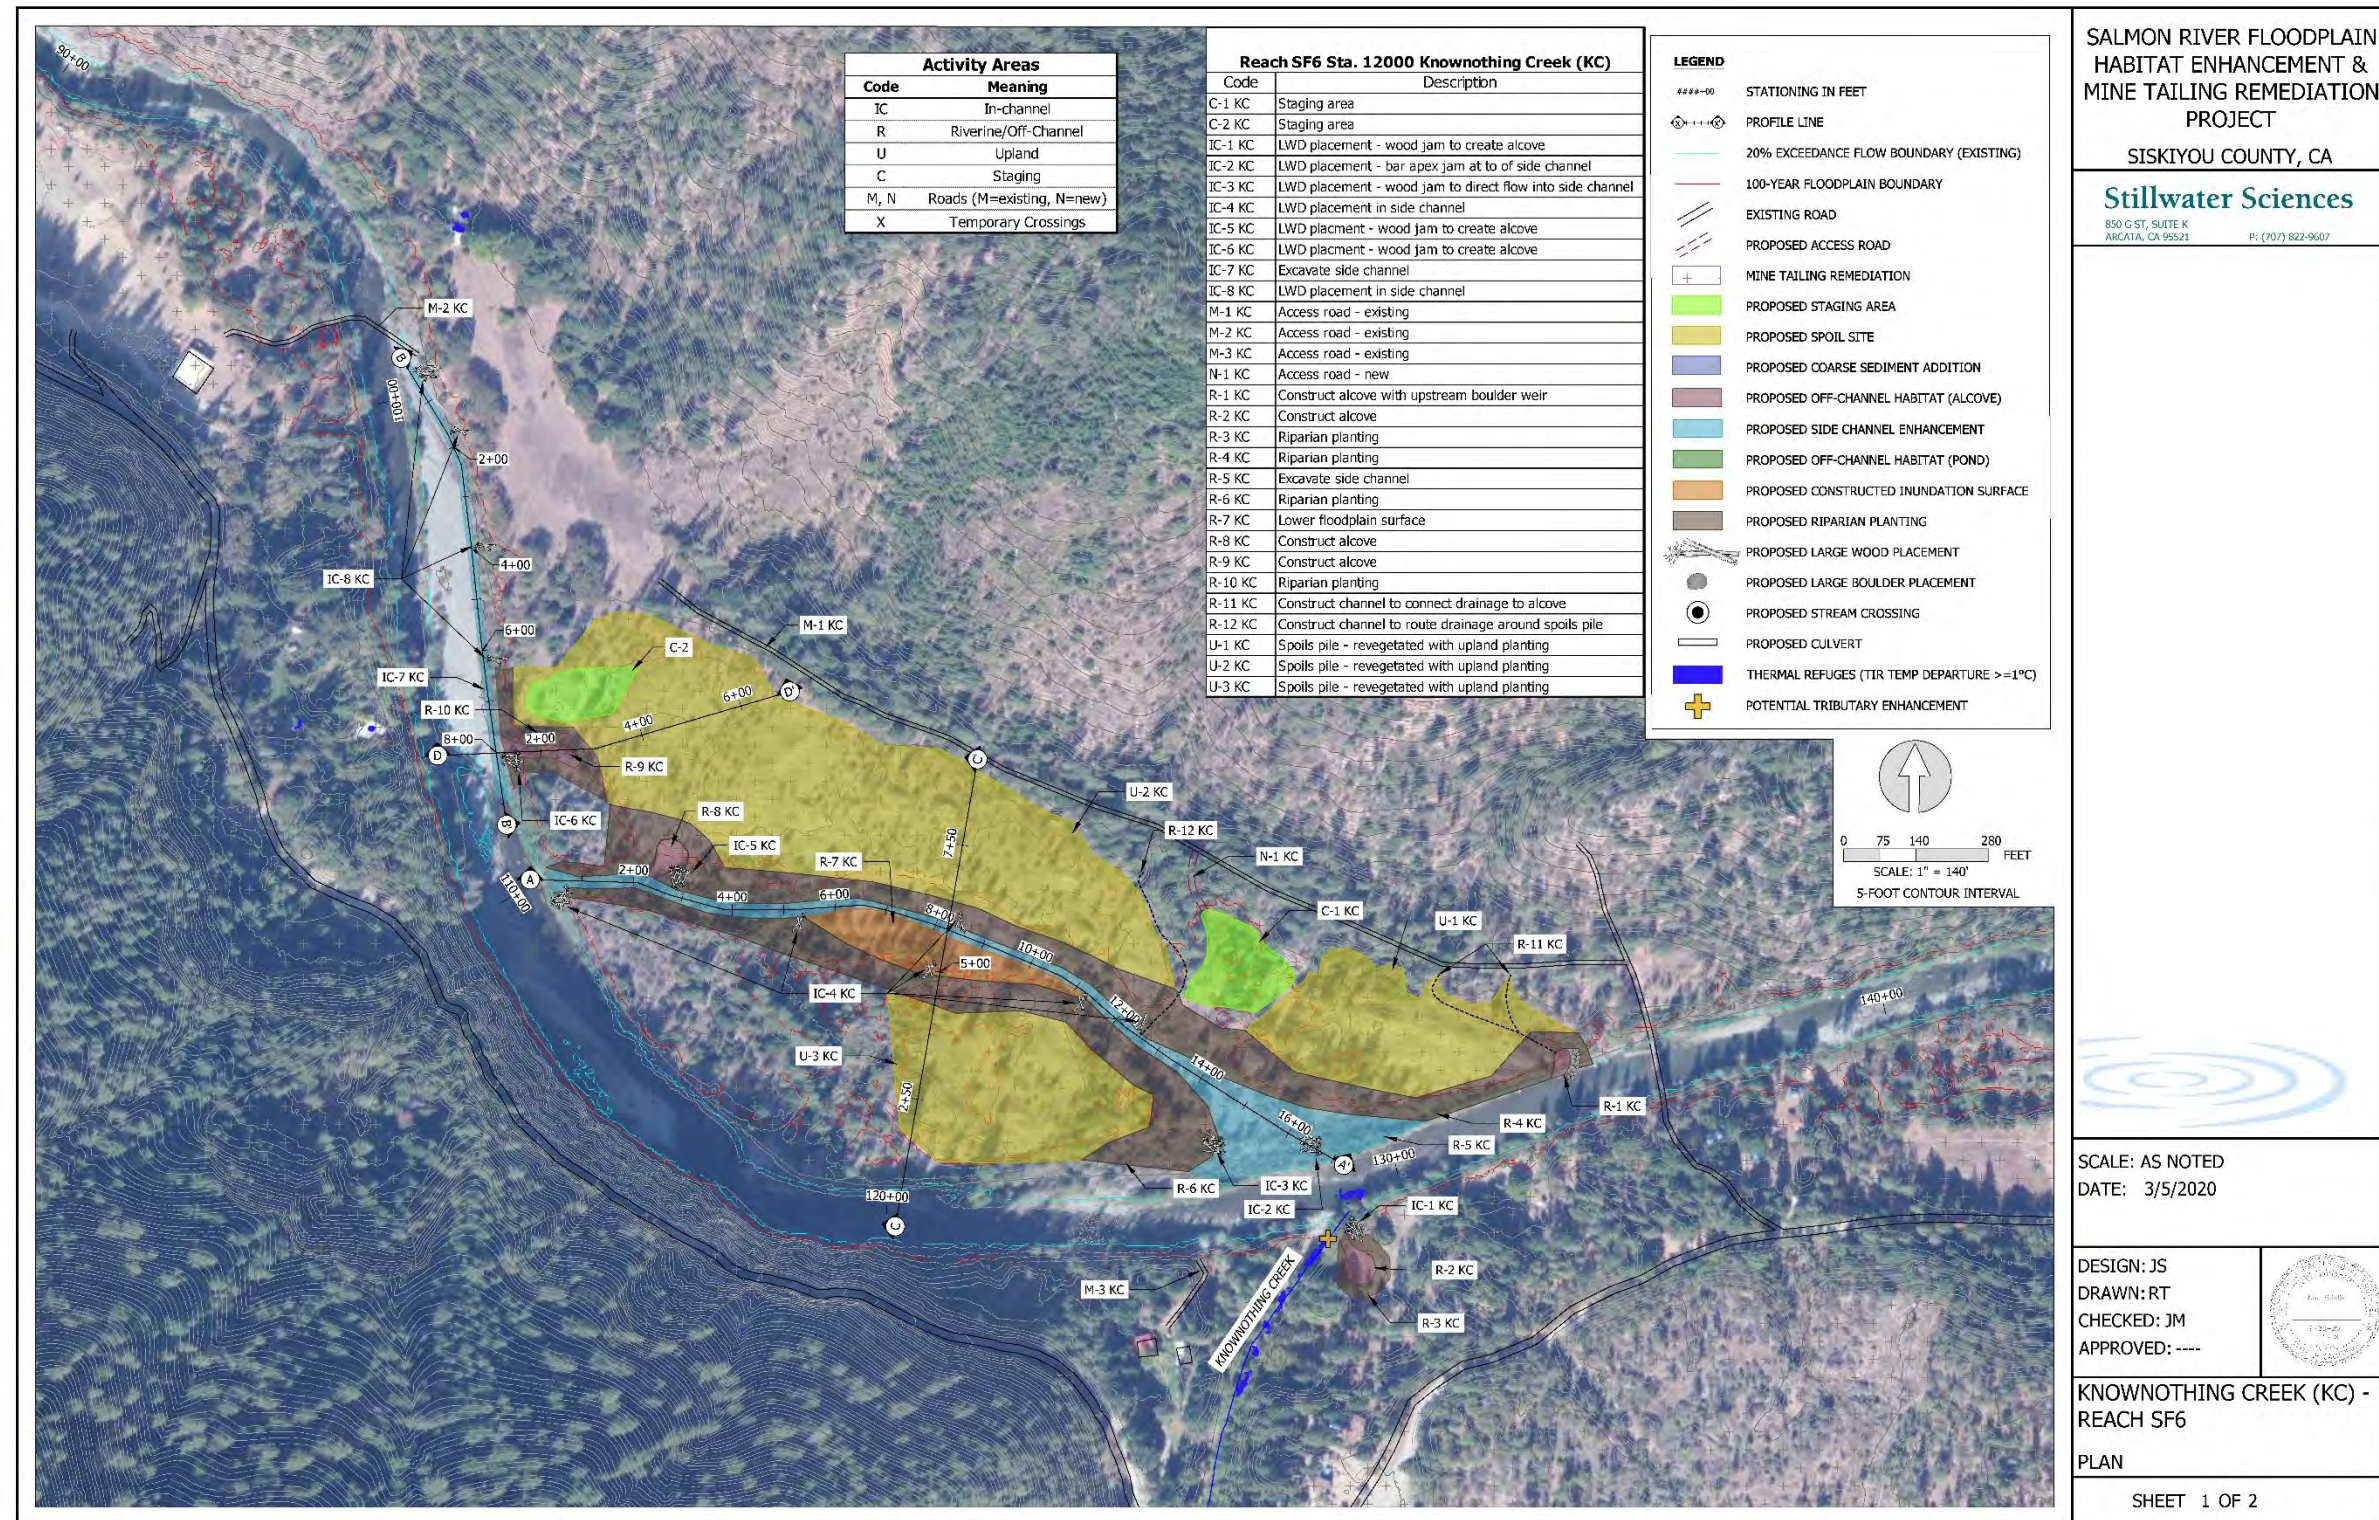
Design plan for South Fork Reach 6 at Knownothing Creek.
